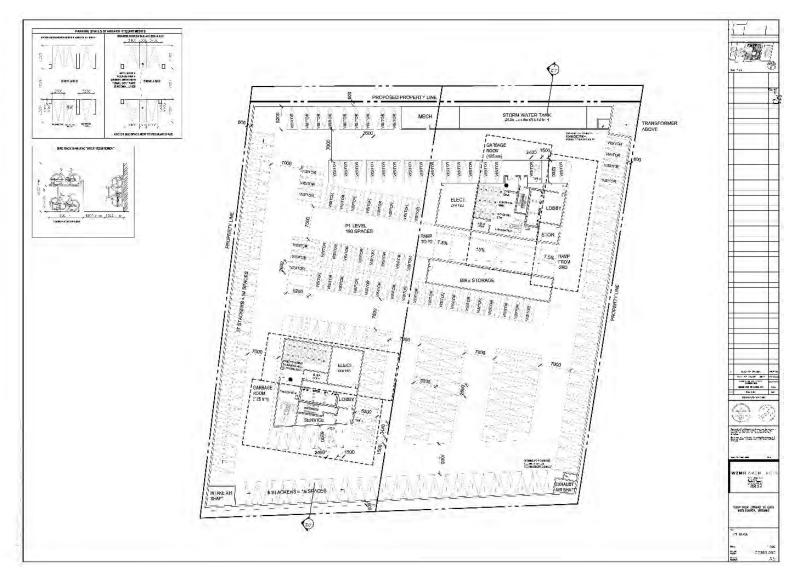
Figure N Parking Level 1 Plan for Proposed Mixed Use Redevelopment for 1000 and 1024 Dundas Street East showing Visitor Parking
